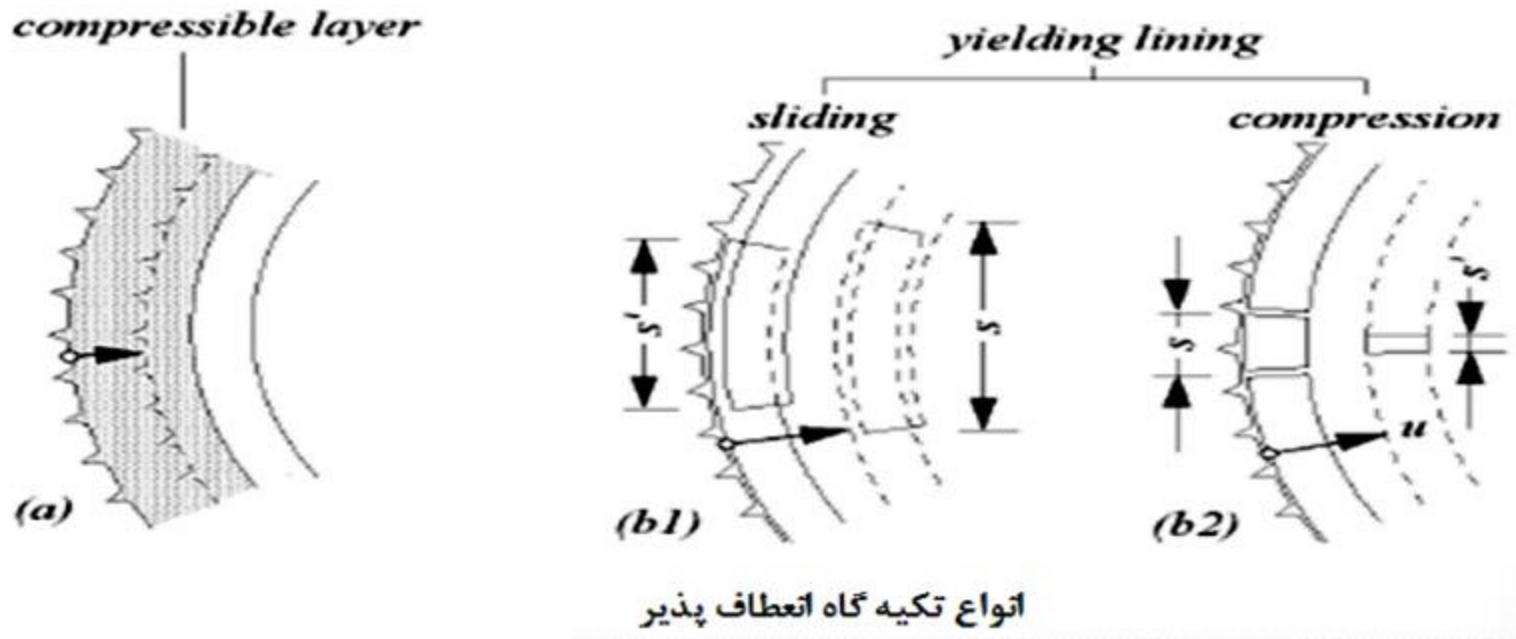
Yielding support concepts. (a) Back-packing with wood between steel support and rock, (b) Interlayer of wooden panels in the concrete lining (Heise and Herbst, 1913)
